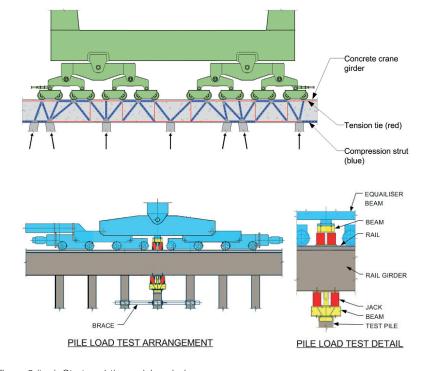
(top): Strut-and-tie model analysis; Figure 4 (bottom). Pile load test arrangement and loading detail.
